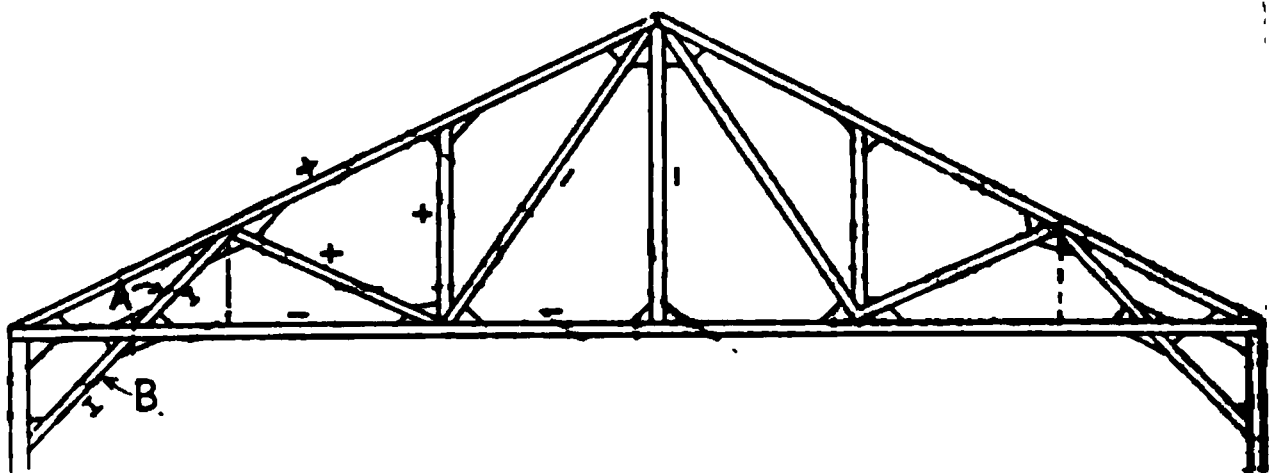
Fan Truss with Knee-braces. Spans from Forty to Sixty Feet
